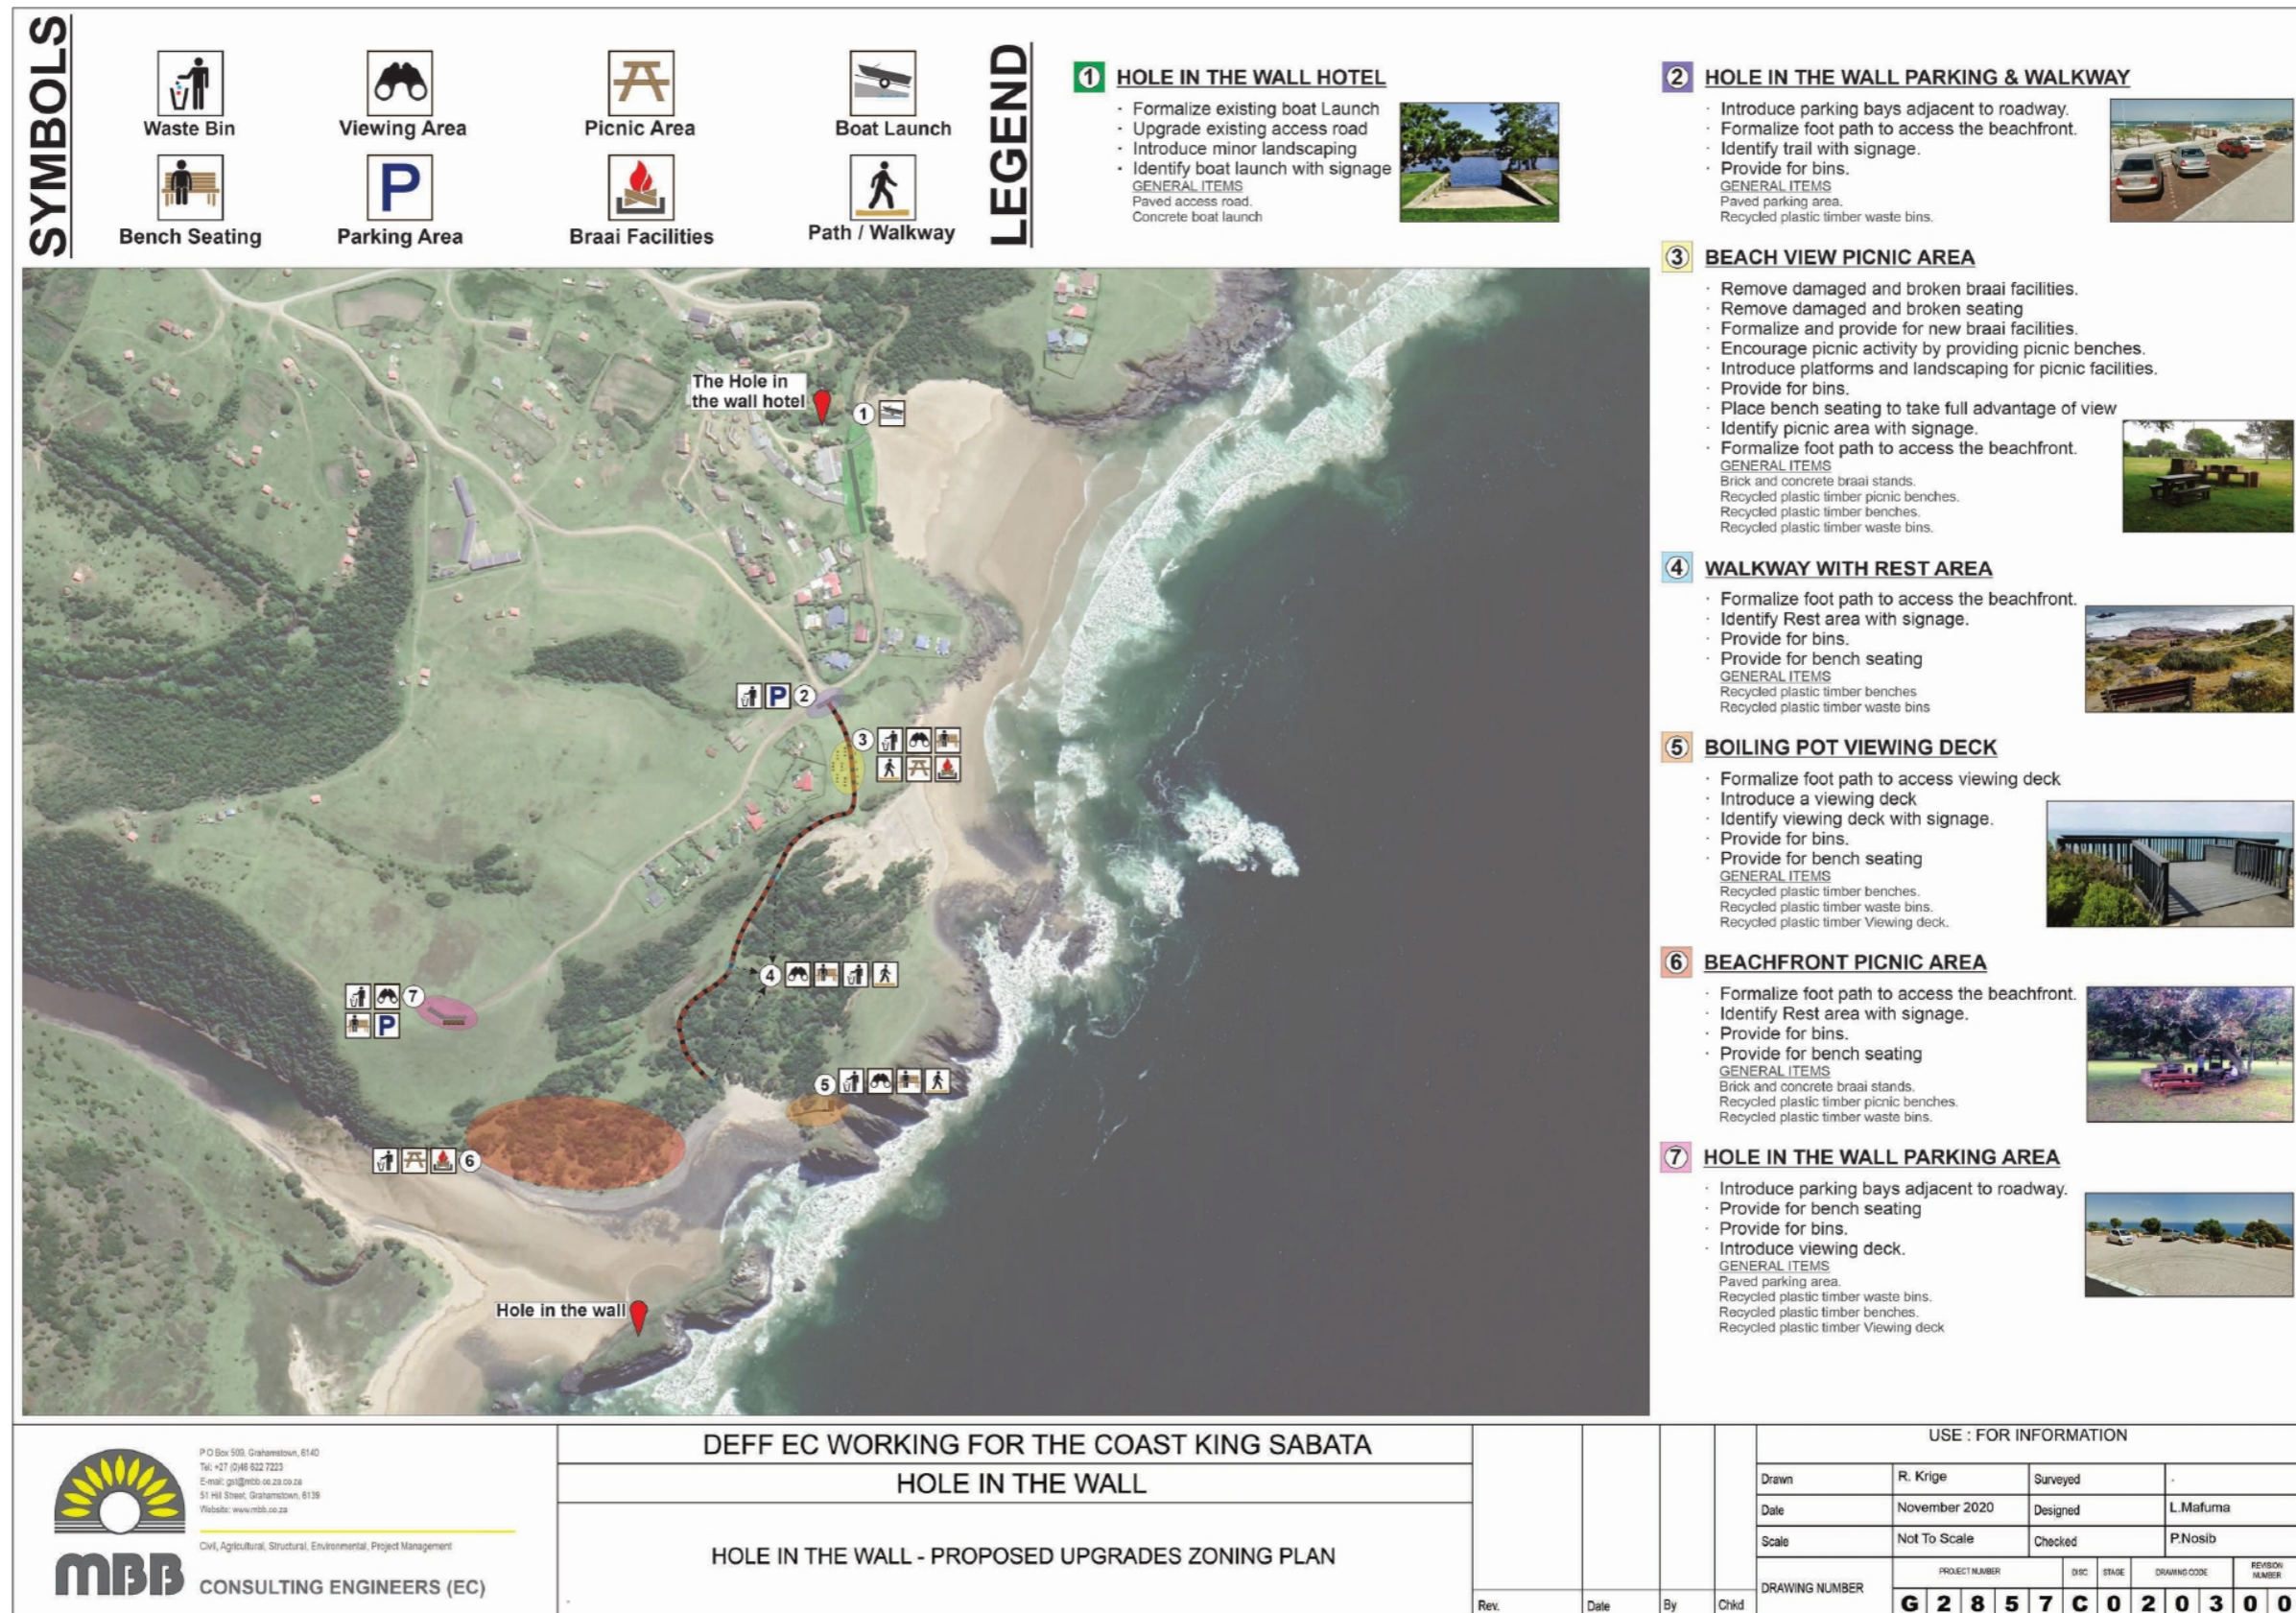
Hole in the Wall – Proposed Upgrades Zoning Plan
